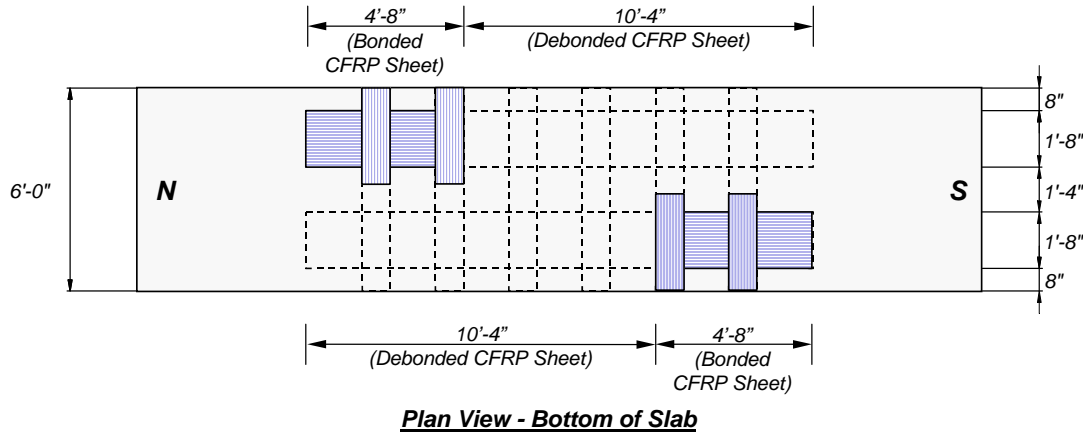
Bottom View of Specimen FS-2 Indicating the Extent of Debonding of CFRP Sheets
